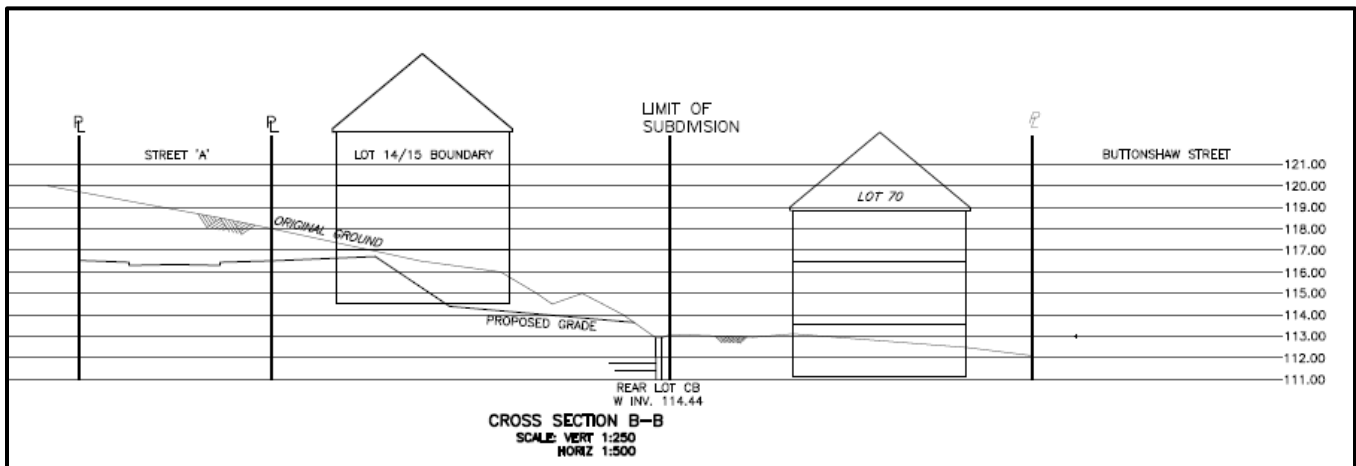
Existing Three-Storey Walkout Condition adjacent to Two-Storey Dwelling
